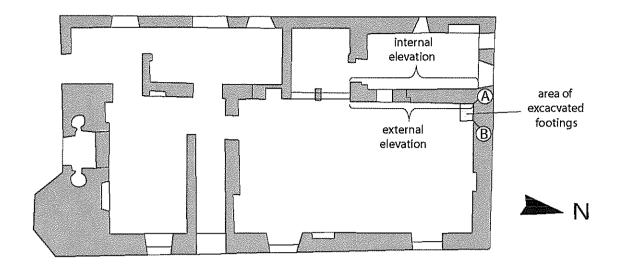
Plan of Flimston Farmhouse showing location of excavation and elevations
